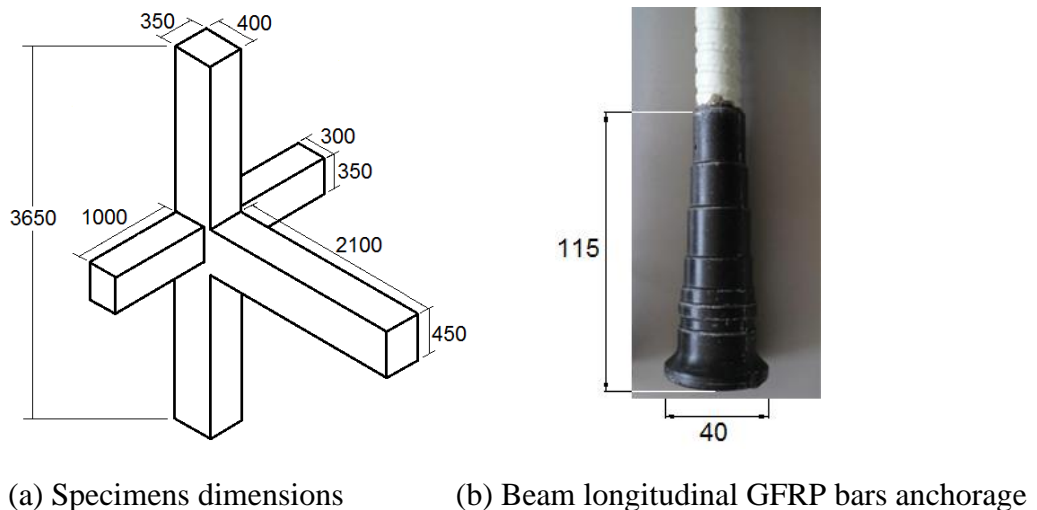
Specimens dimensions and GFRP bars anchorage type (dimensions in mm)
